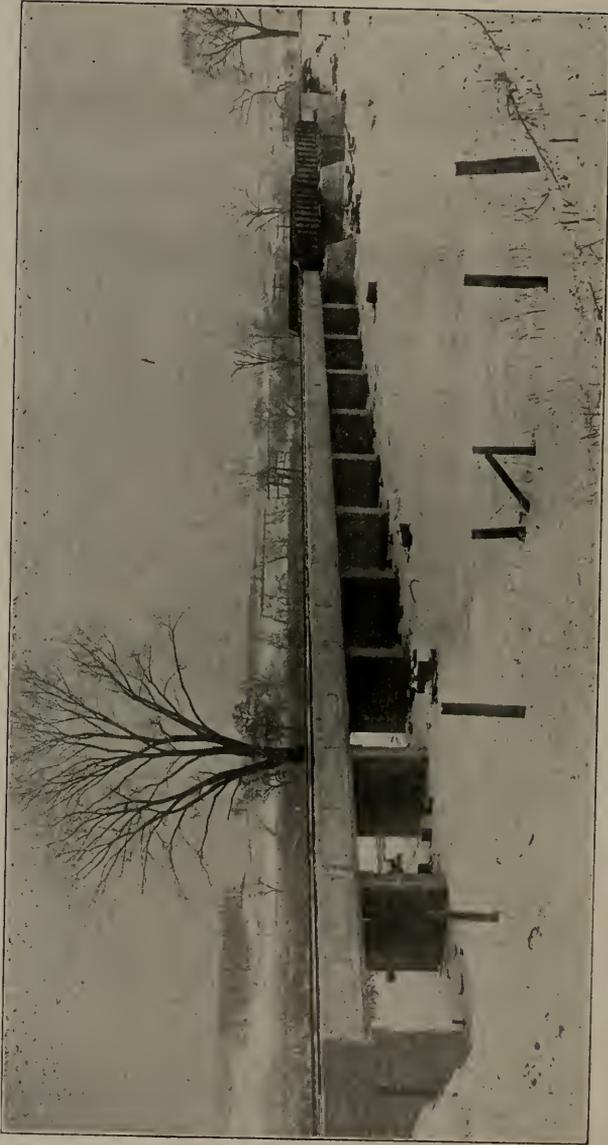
REINFORCED CONCRETE TRESTLE—CHICAGO, MILWAUKEE & ST. PAUL RAILWAY.
